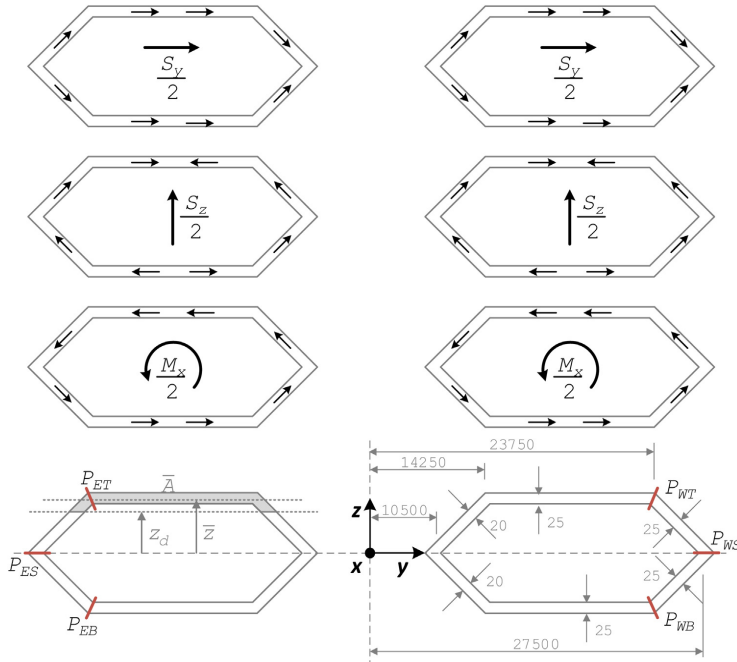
Bridge girder cross-section with critical points and assumed stress distribution for calculating cross-sectional stresses. All measurements are in mm.
